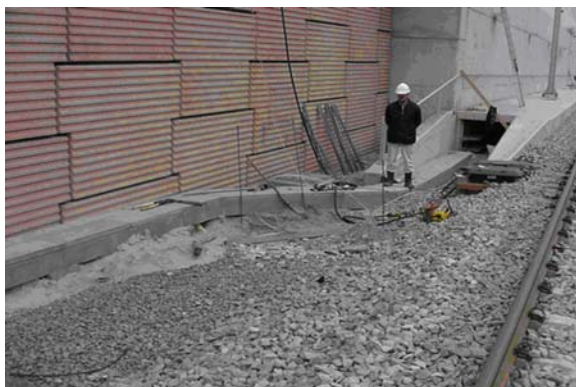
Geomembrane perforation below a underground railway track by installing earth pins for de-electrification [Dutch railway authorities]
